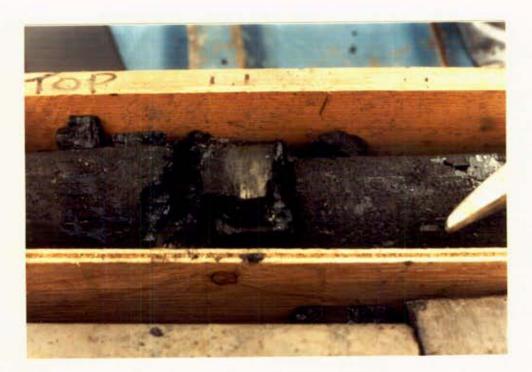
PLATE IV. - Core retrieval operations, Hole HL-84-05C.
